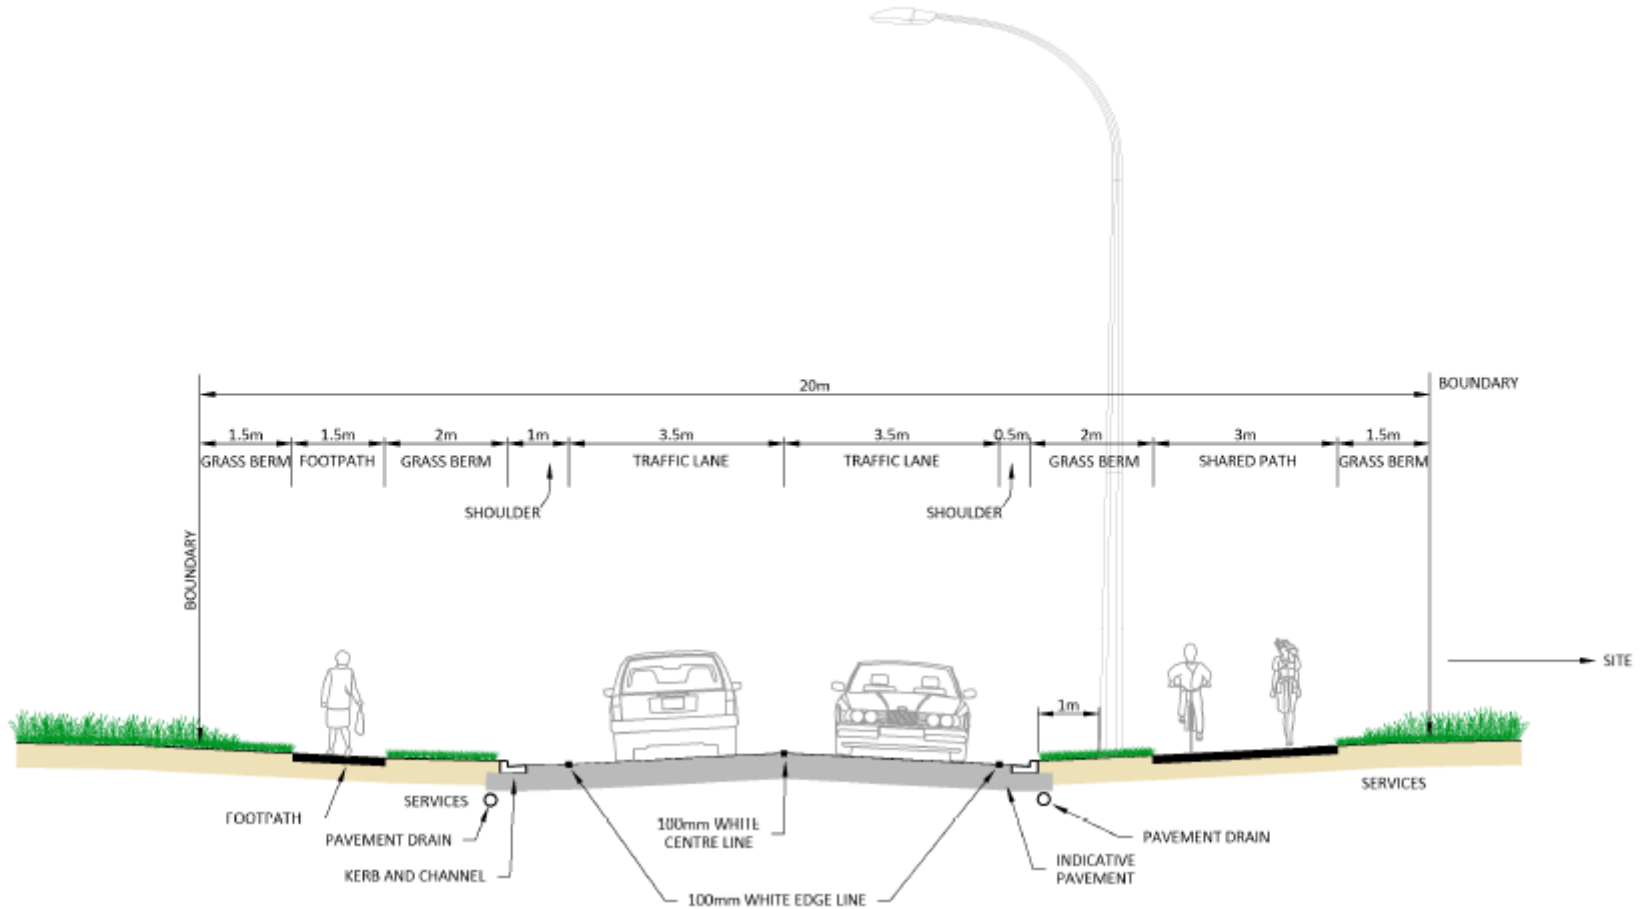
Ohinewai Structure Plan - Typical Cross-section through Balemi Road from Lumsden Road to easternmost access of Industrial precinct.
